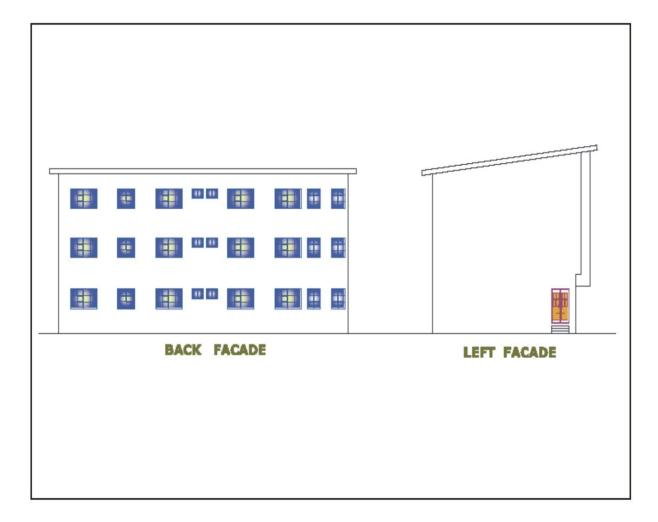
Prototype Botanical Garden Structure Office Building Back and Left Elevations Plans.
